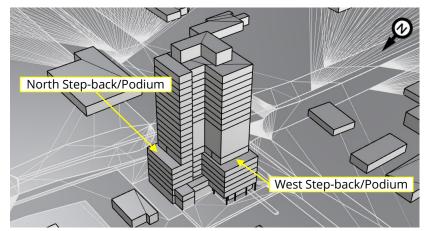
3D Model of the Proposed Project (Courtesy of Kirkor Architects and Planners)
